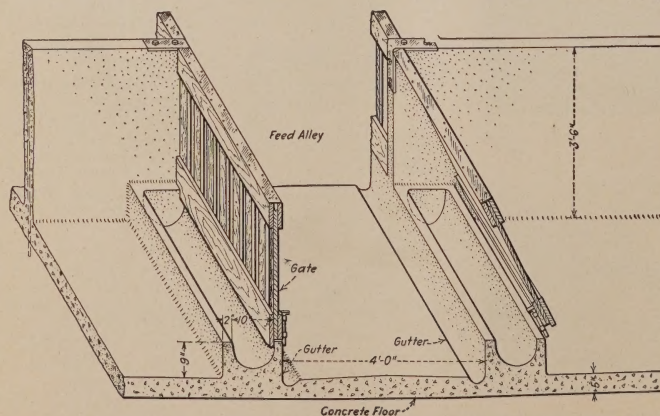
At left: Section of model hog-house showing partition walls, feeding troughs and gutters. Notice the swinging wood gate the same as shown in photograph above.
